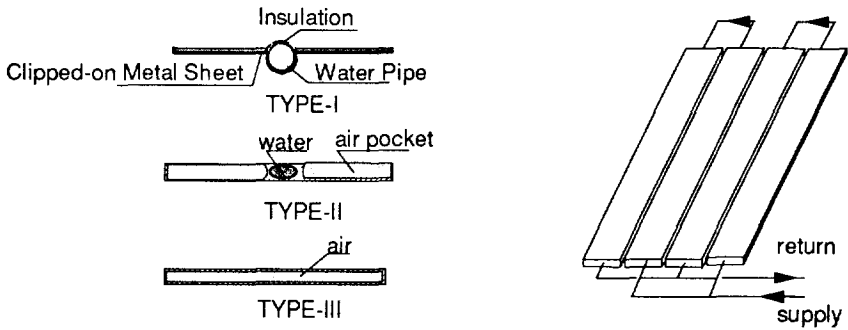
Different types of ceiling panels and their arrangement in a room
